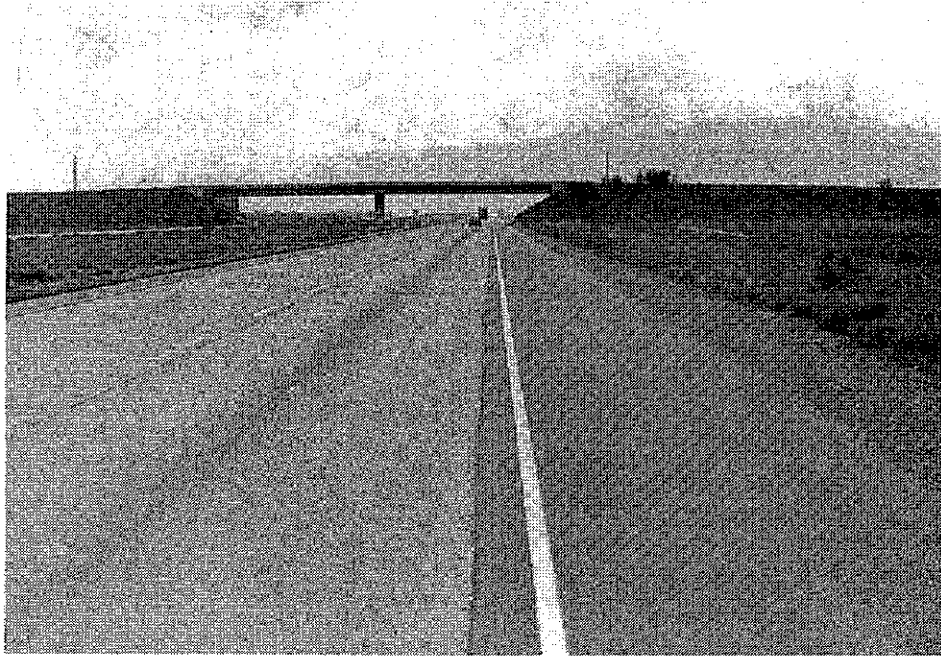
Note evidence of pumping and depressed shoulder in section with extra rich concrete.
